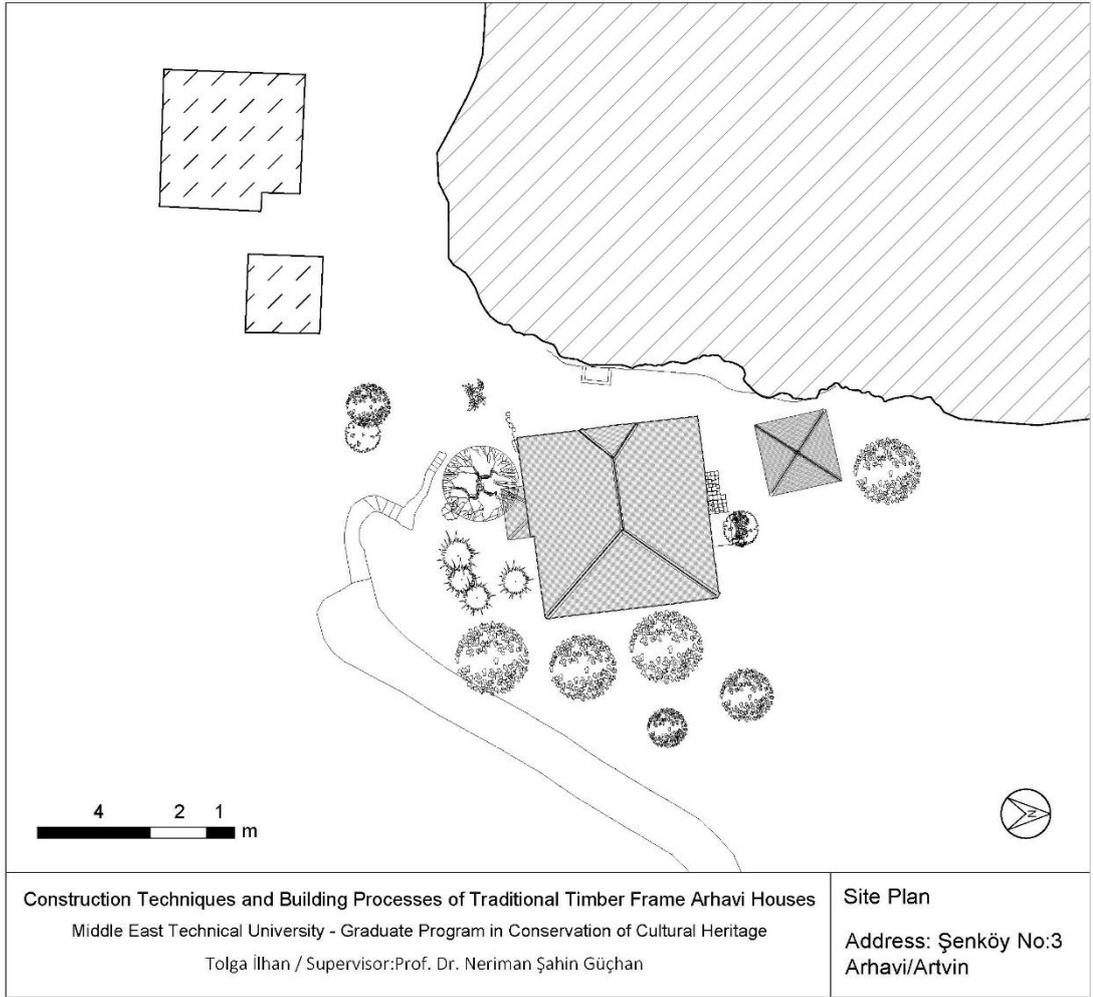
Site plan of Bilgin House and surrounding structures.
